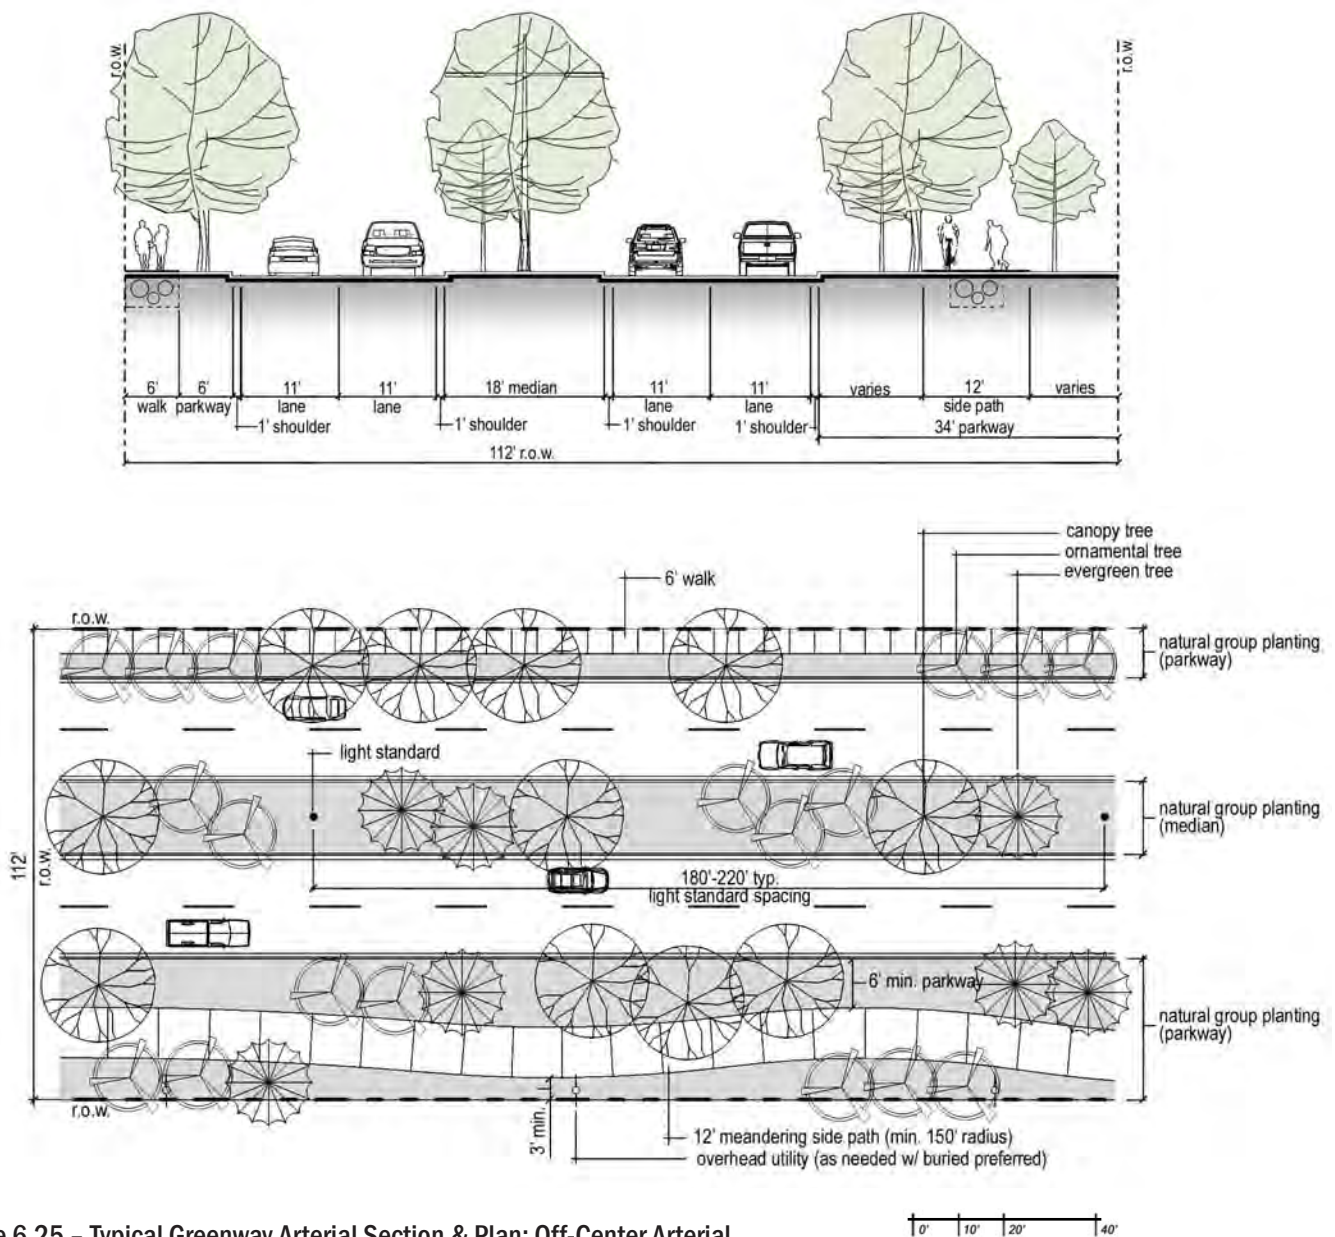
Typical Greenway Arterial Section & Plan: Off-Center Arterial
